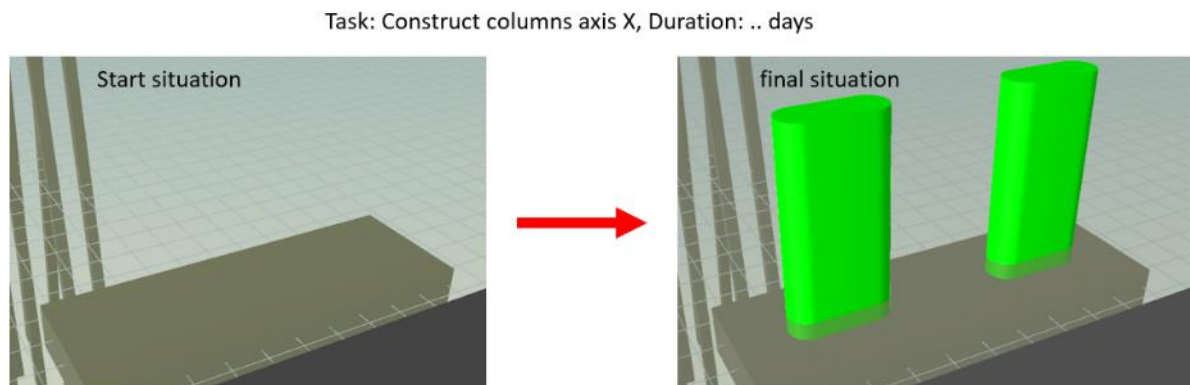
Elements being modelled - Construction of two columns (from BAM viaduct case)
